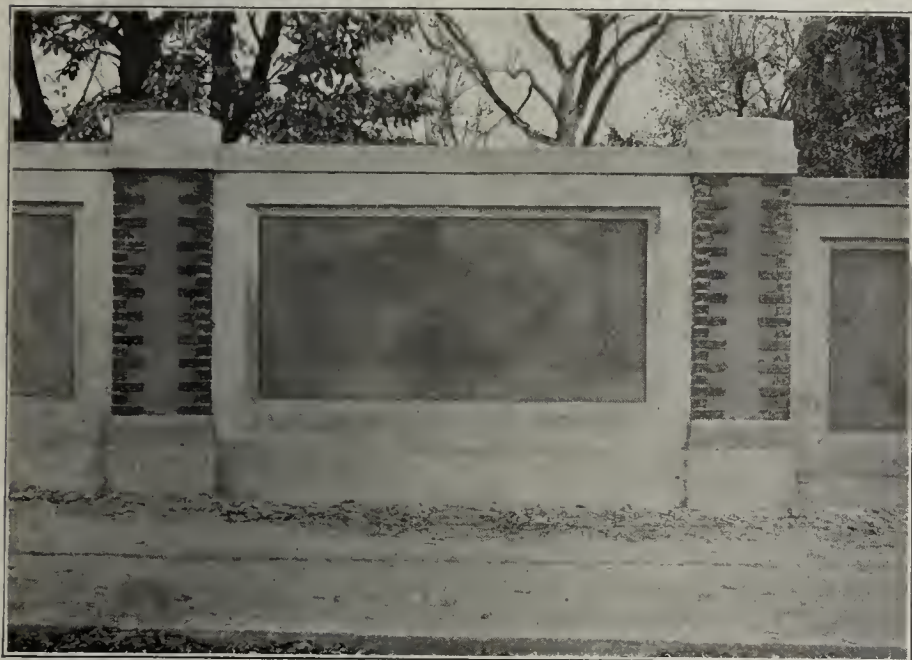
Cement Gun Construction on Wall of the Boston Elevated Railway.
